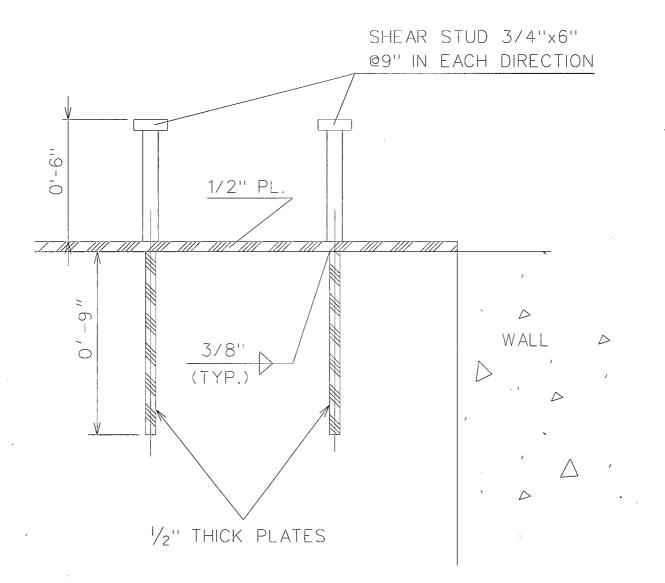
Auxiliary Building Finned Floor (Sheet 3 of 3)
